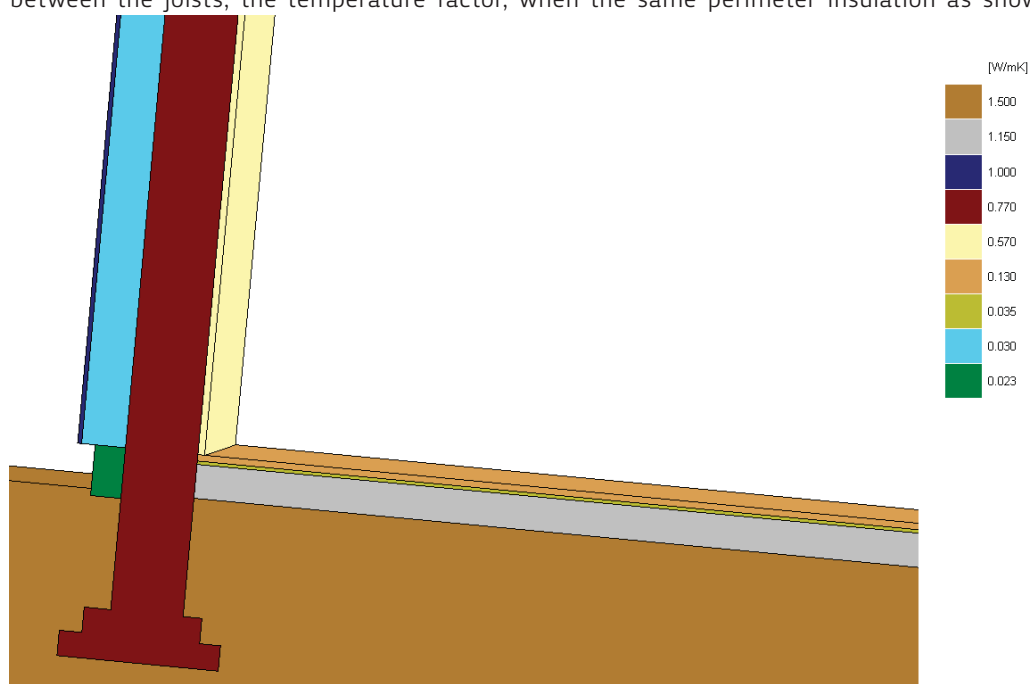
EWI solid wall-floor junction with perimeter insulation: Materials modelled in TRISCO
